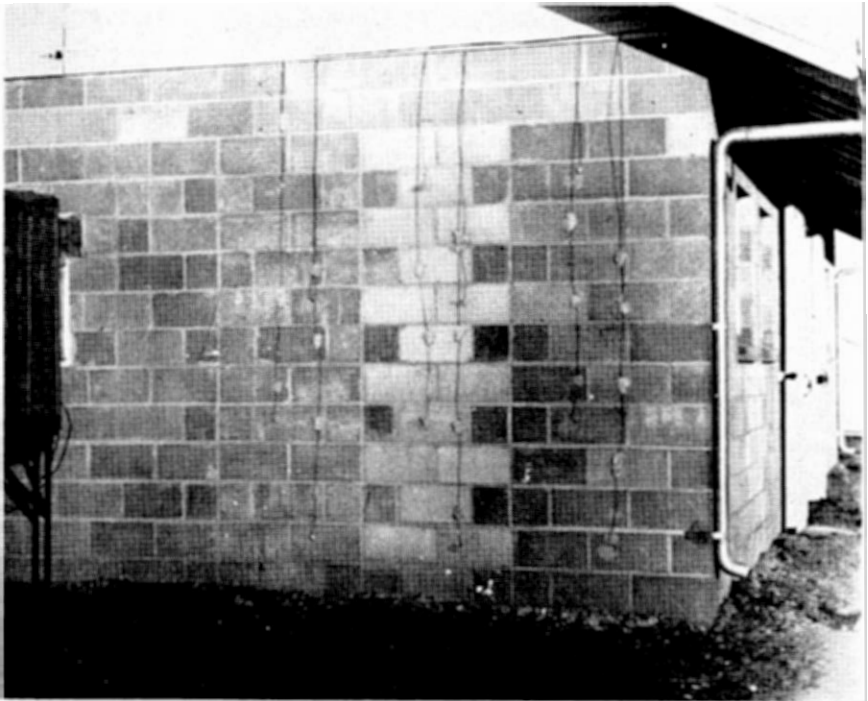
Experimental panels of concrete block masonry in west-facing wall of cattle shelter.
